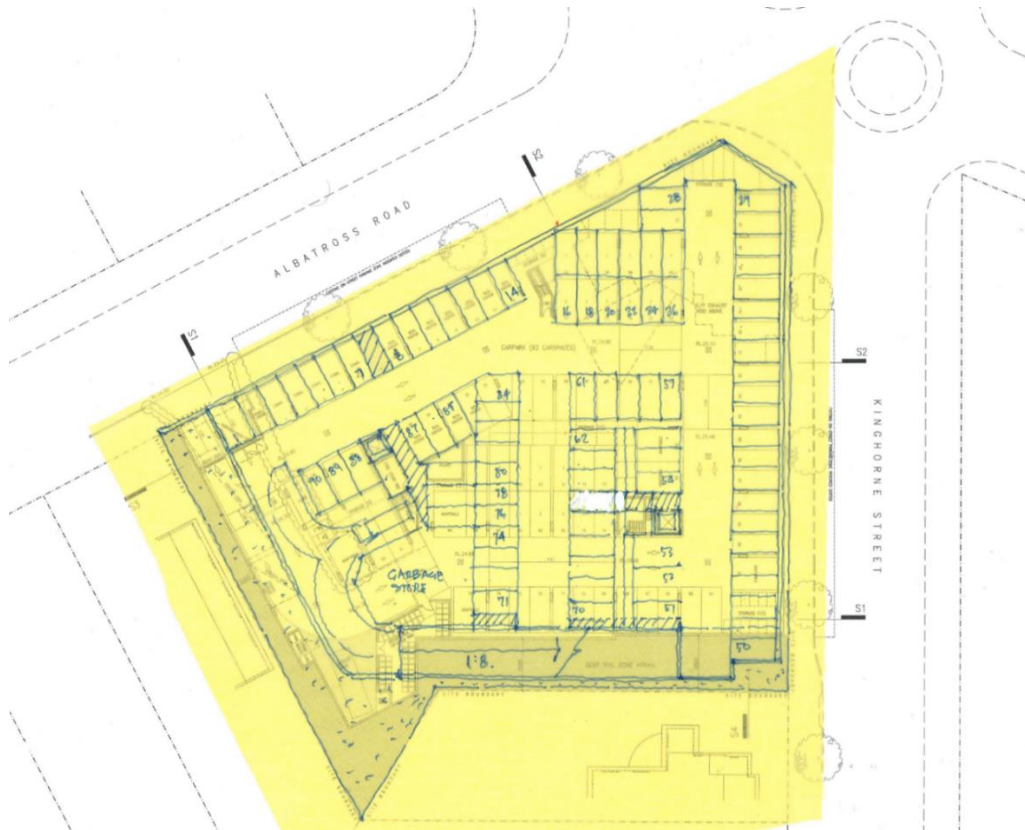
Applicant's submitted concept plan, demonstrating that access via Kinghorne Street is capable of being achieved.
